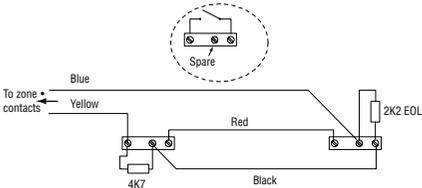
Example: Wiring Two Door Contacts to One FSL Zone.
